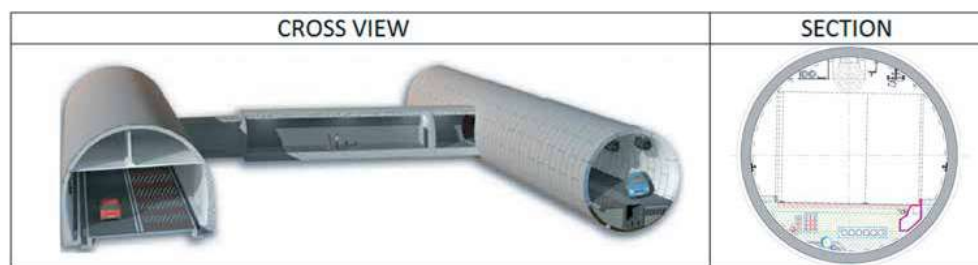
Cross view of the Frejus tunnels and section of the safety tunnel
